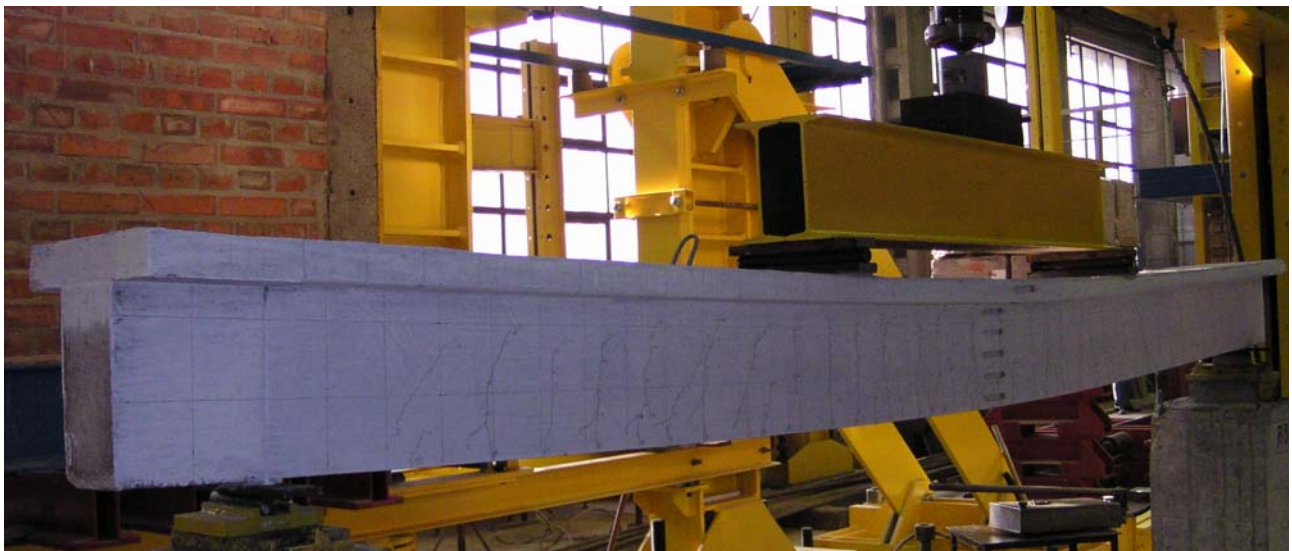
Beam 8-mBT after test – regular cracks on the surface of concrete formed against CPF
